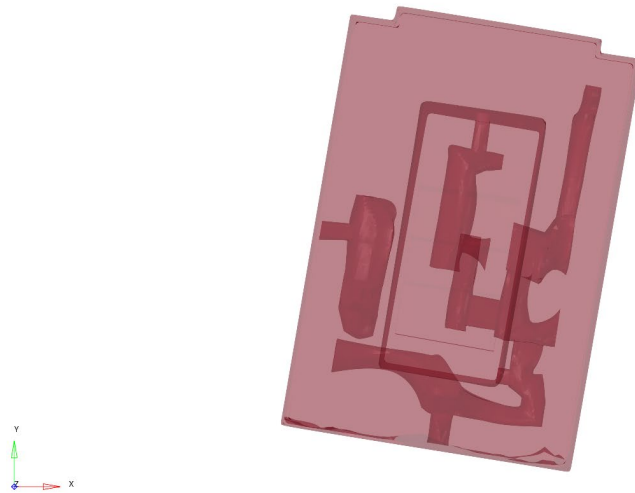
Plan view showing excavated areas within Rosalila for configuration E
